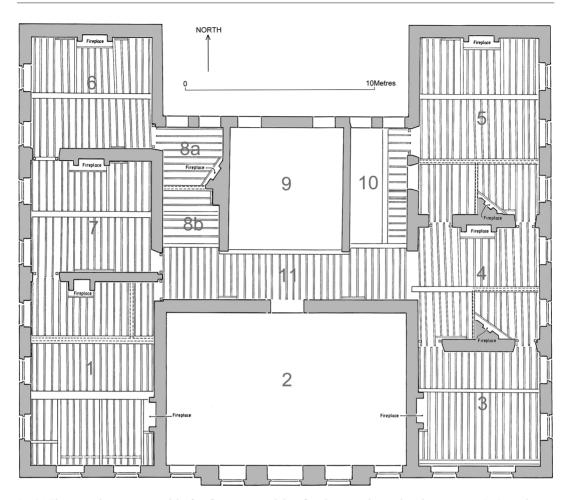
The original arrangement of the first-floor rooms and their floor beams and joists, based on surviving *in situ* evidence and salvaged timbers, with the room numbers used during the restoration and in the text.
